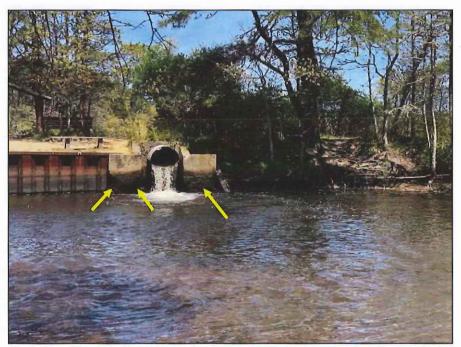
Discharge headwall. Note the scour on the headwall both left and right of the outlet.
